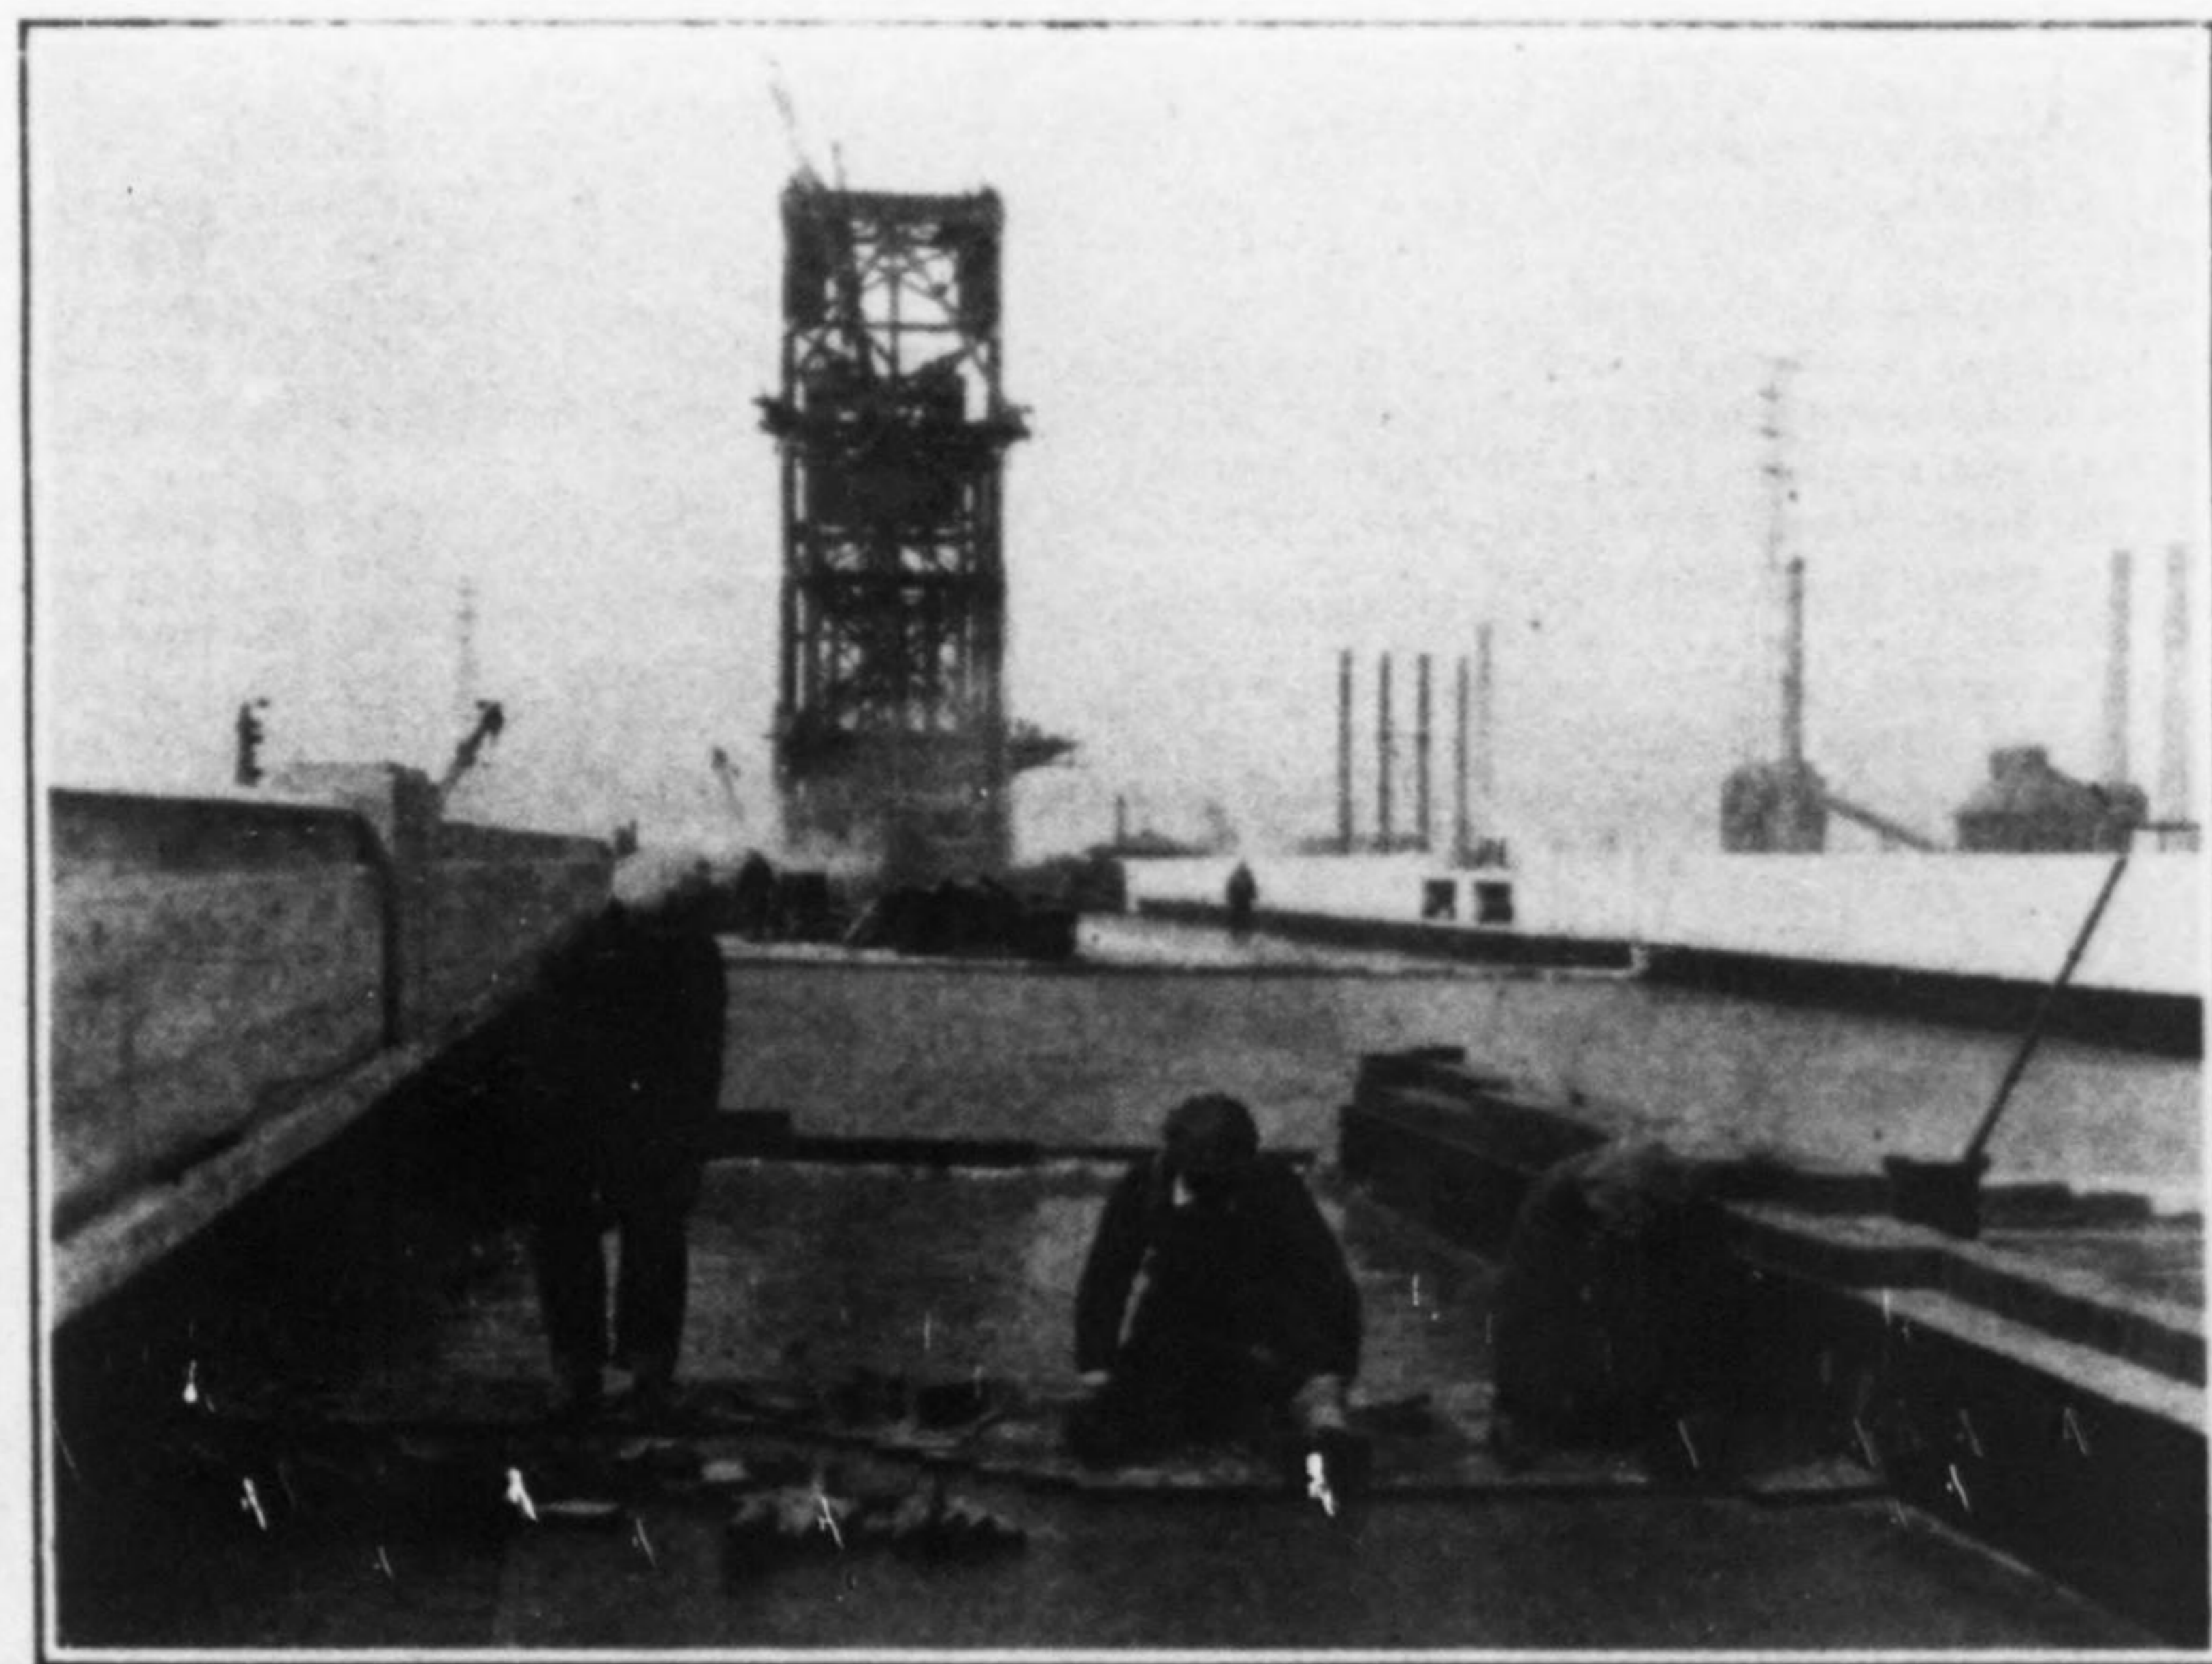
LAYING WATERPROOFING BLOCKS ON COMPLETED DECK SECTION. EAST TOWER IN BACKGROUND
